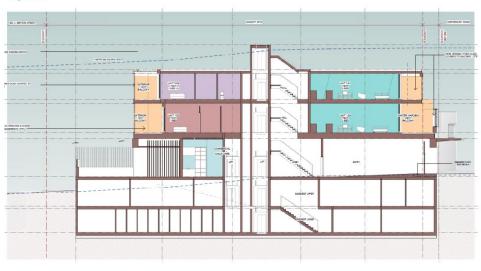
Section indicating extent of lift overrun above 13m height limit (looking north)
